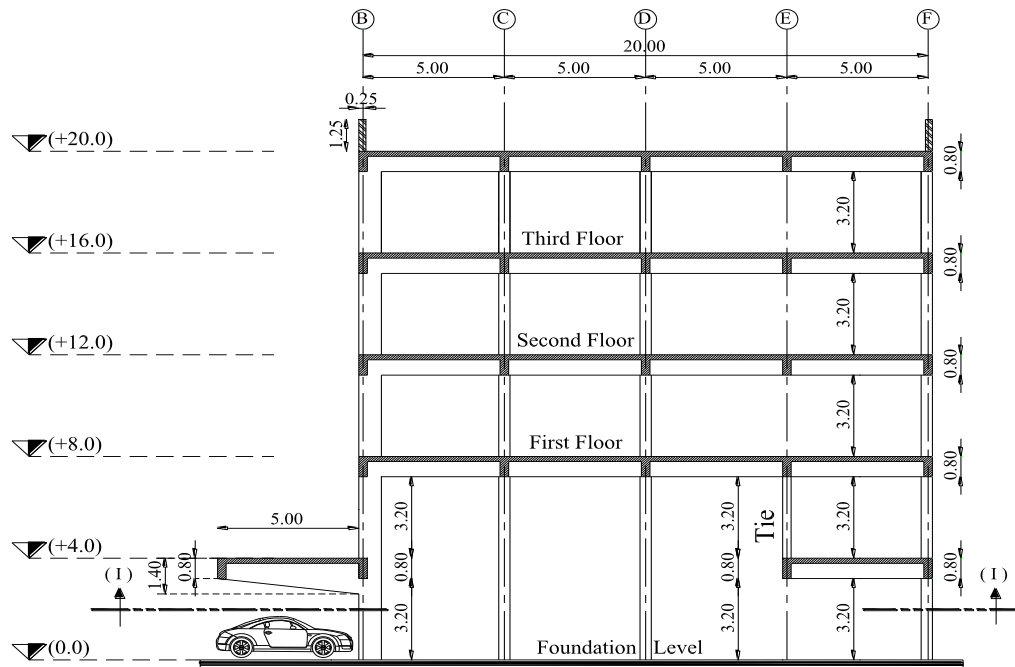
shows a structural plan and a sectional elevation for a multi-story center, if you know that:
